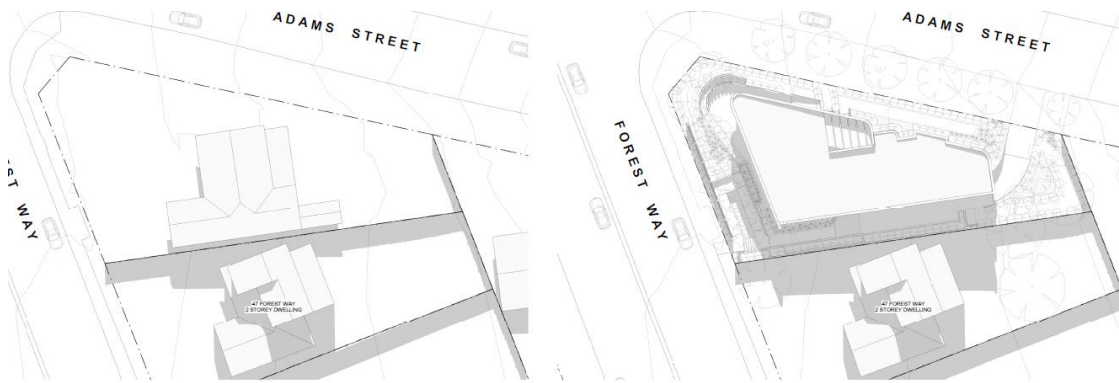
the existing and proposed shading impact to the southern adjoining development at 12pm
